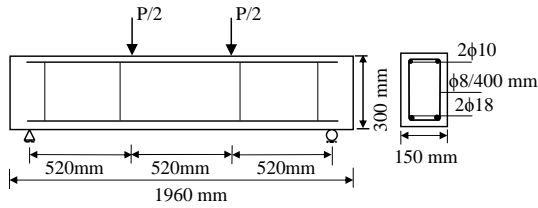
Geometry, arrangement of reinforcement and load of the tested beams.
